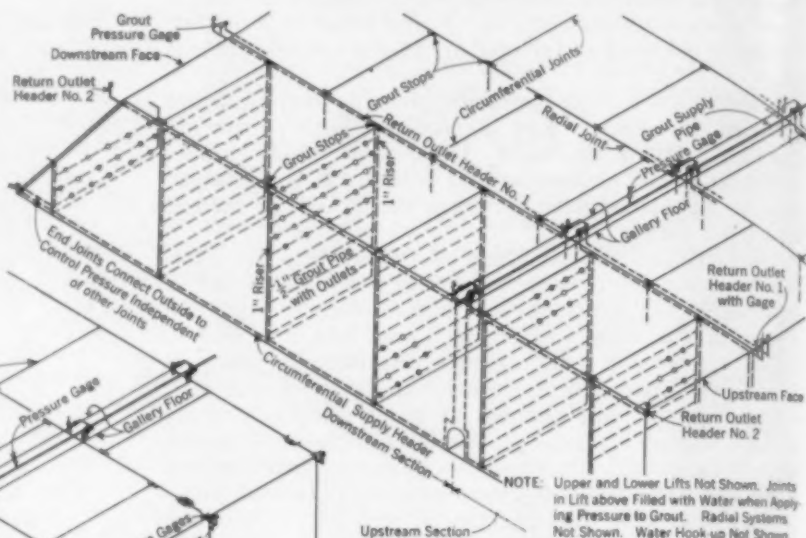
HOOK-UP FOR GROUTING A GROUP OF CIRCUMFERENTIAL JOINTS OR ROWS
